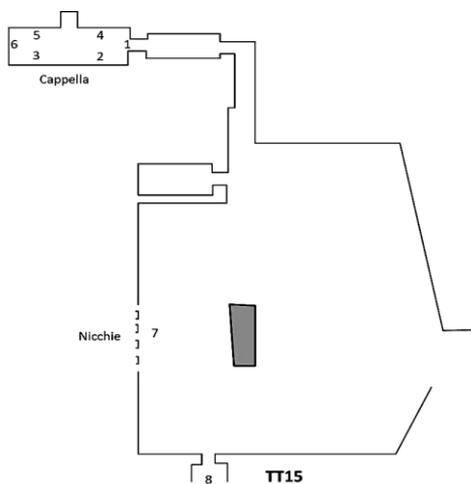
Floor plan of the tomb TT15 at Dra' Abu El-Naga Necropolis
